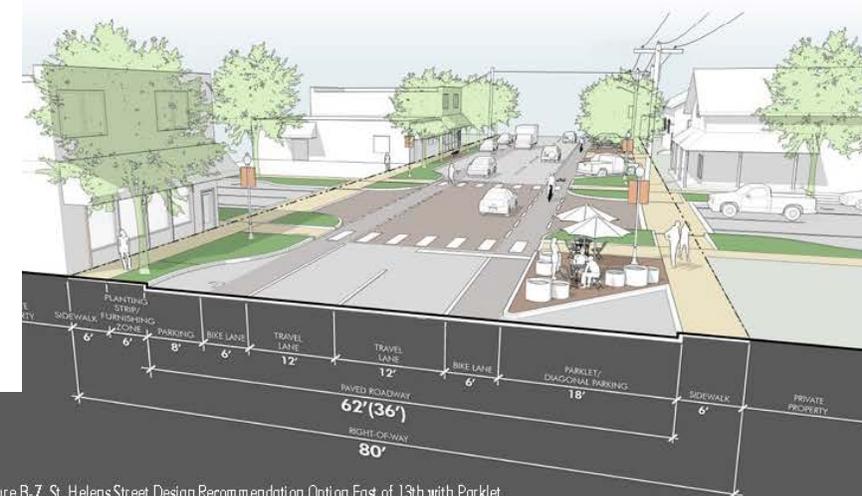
St. Helens Street Design Recommendation Option East of 13th with Parklet
